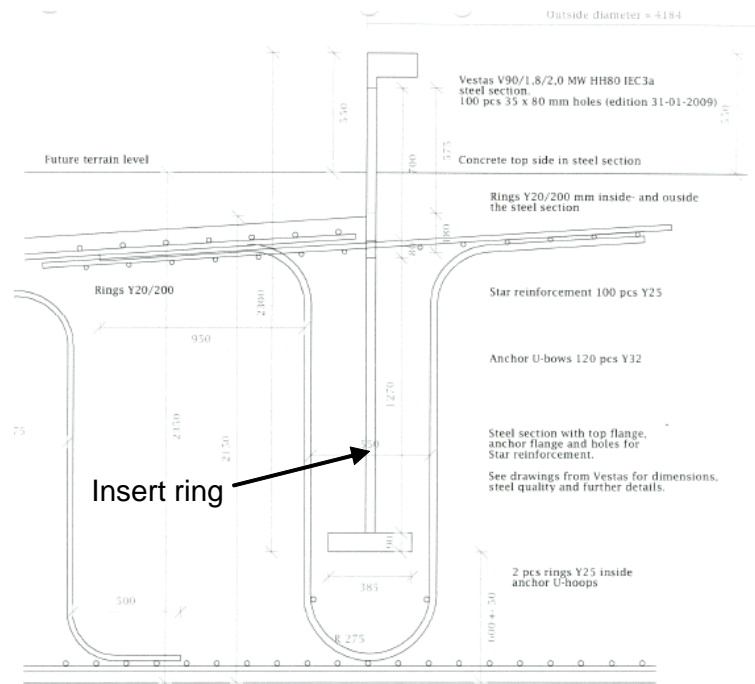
Insert ring embedded in concrete foundation, [6]. The original drawing is shown in Appendix 1.
